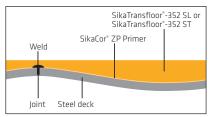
Cross-sectional detail of deck showing levelling of high spots (weld) and uneven surface
